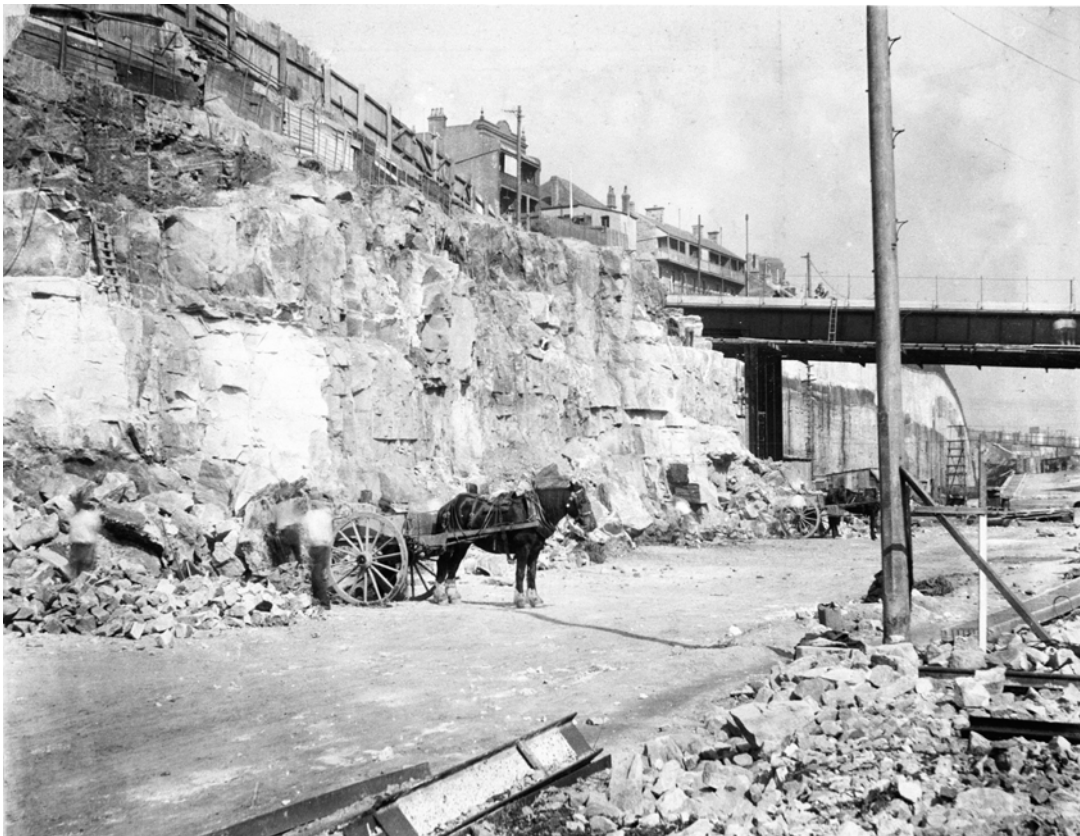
Excavation for new roadway behind Jones Bay Wharf with bridge from Bayview Street in background 1919.
